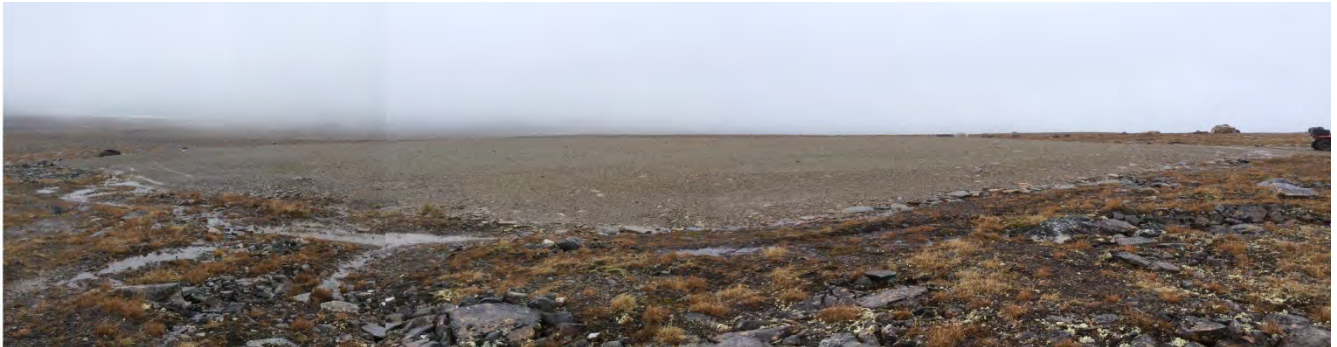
Station West Landfill, Lobe F – Northeast slope, facing west (ATT217\_Photo1.jpg) (ATT218\_Photo2.jpg) (ATT219\_Photo3.jpg)
